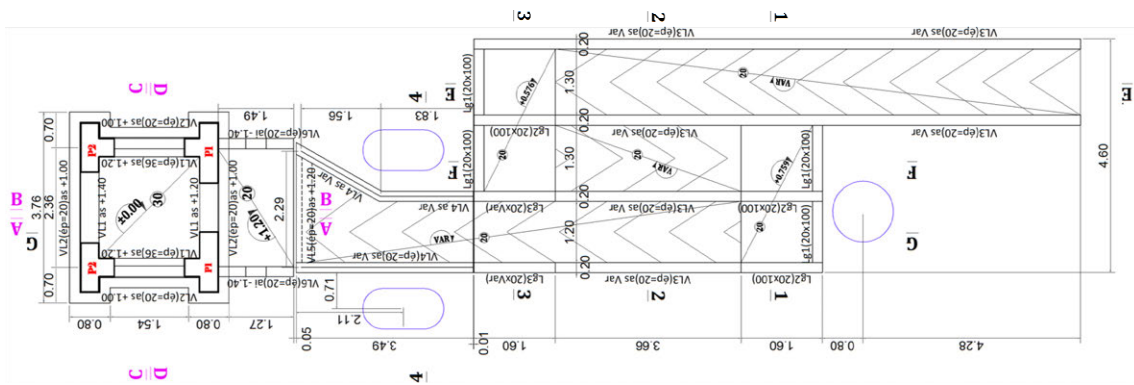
Plan view of the access (ramp and elevator – level 0)
